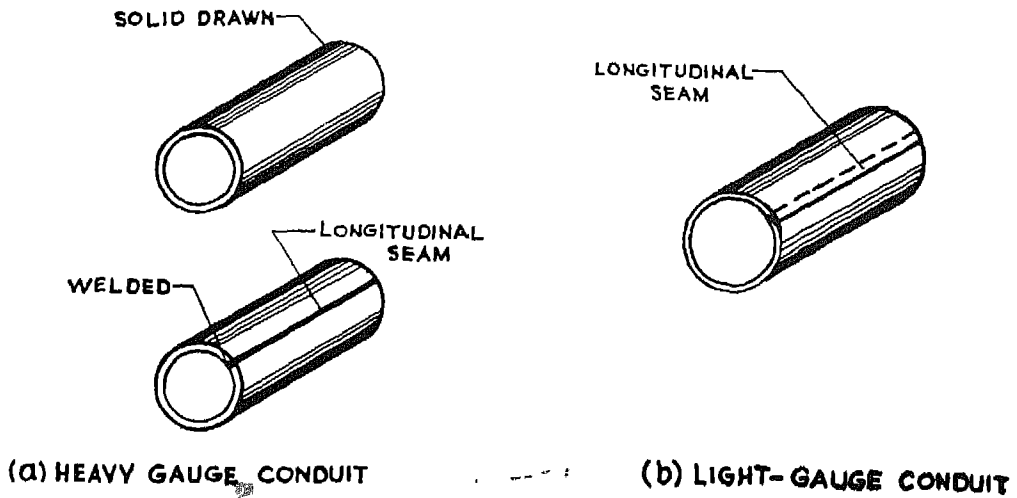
Heavy-gauge and Light-gauge Conduits
